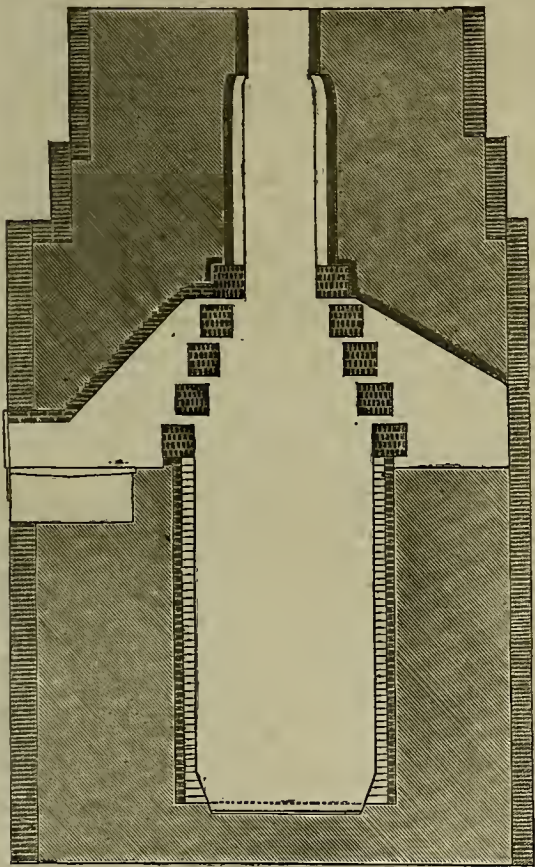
Cross Section of Furnace, Walls and Vapor Way Arches.
